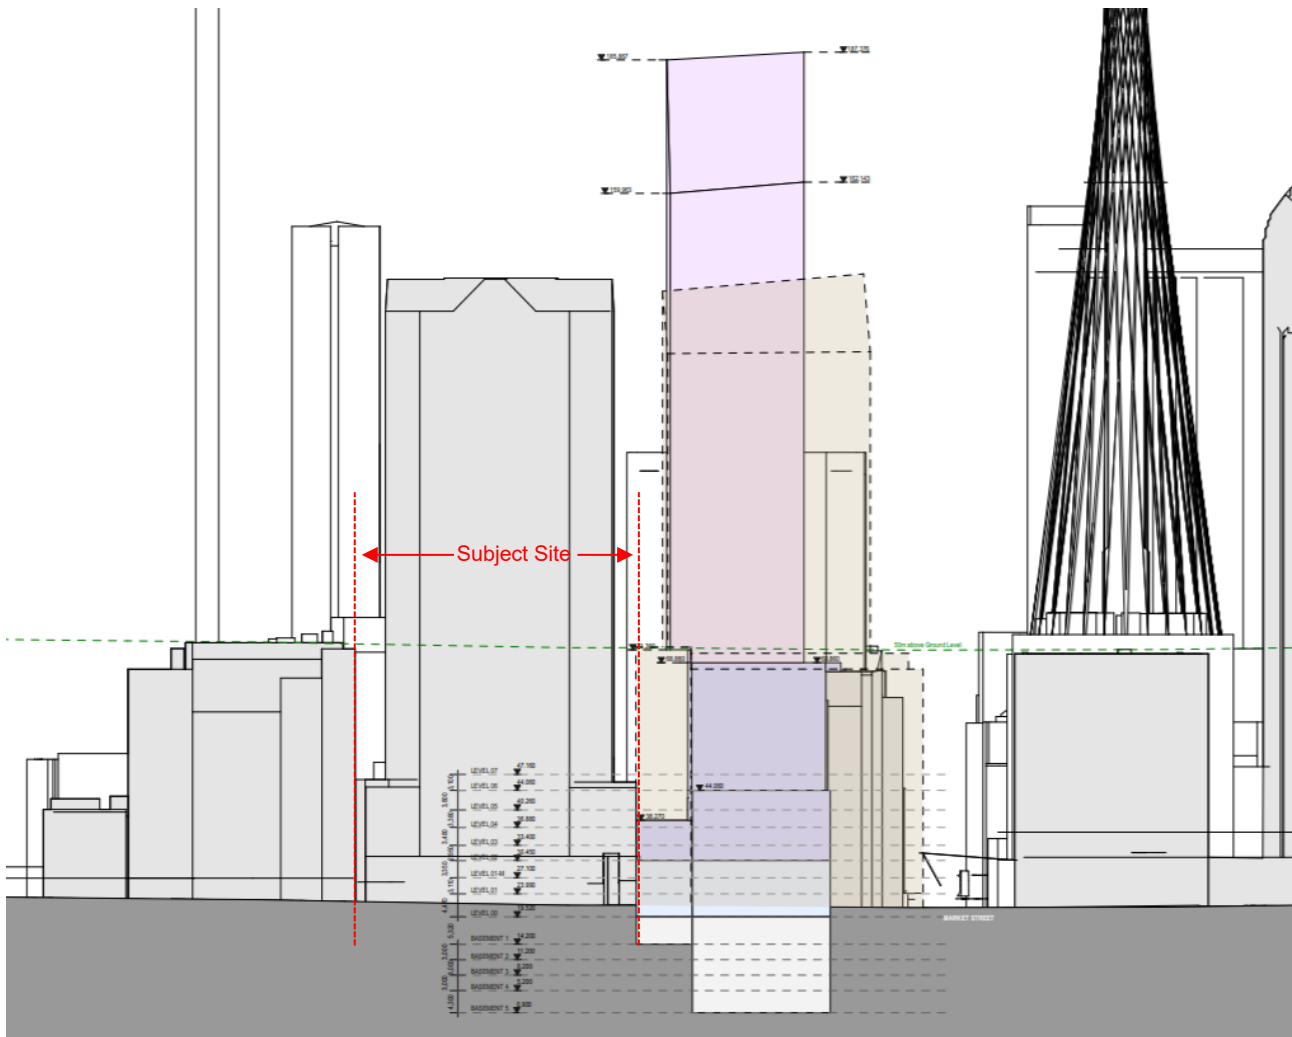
Extract of approved building envelope under D/2018/1246– Castlereagh Street elevation (showing the subject site indicated in red and the approved David Jones envelope in dotted lines with brown shading)
